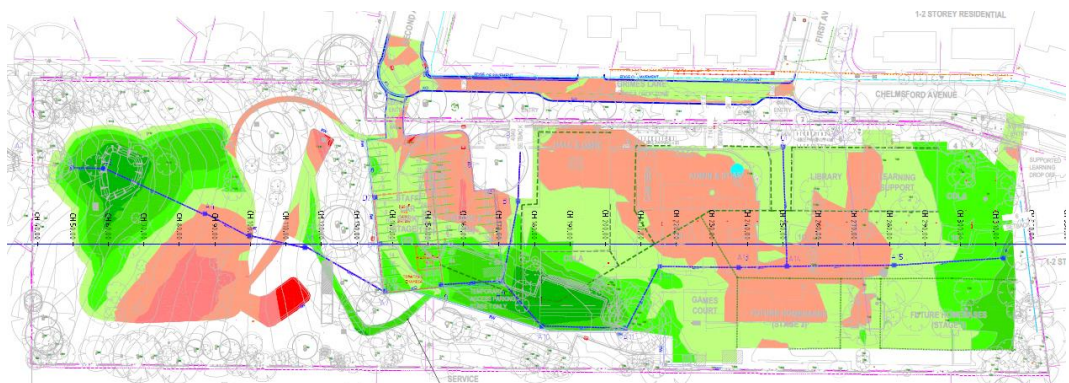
Bulk Earthworks Plan – (Source: PTC)
